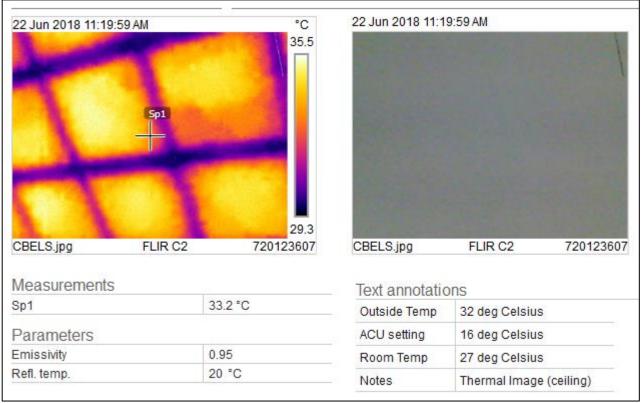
Poor Heat Insulation of Ceilings of Top Floor Rooms
